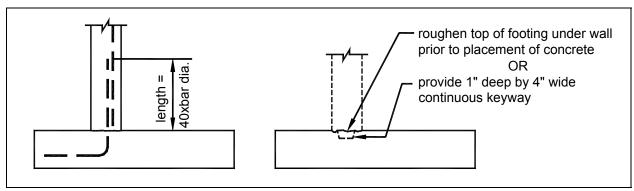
TYPICAL DOWEL AND KEYWAY DETAIL
